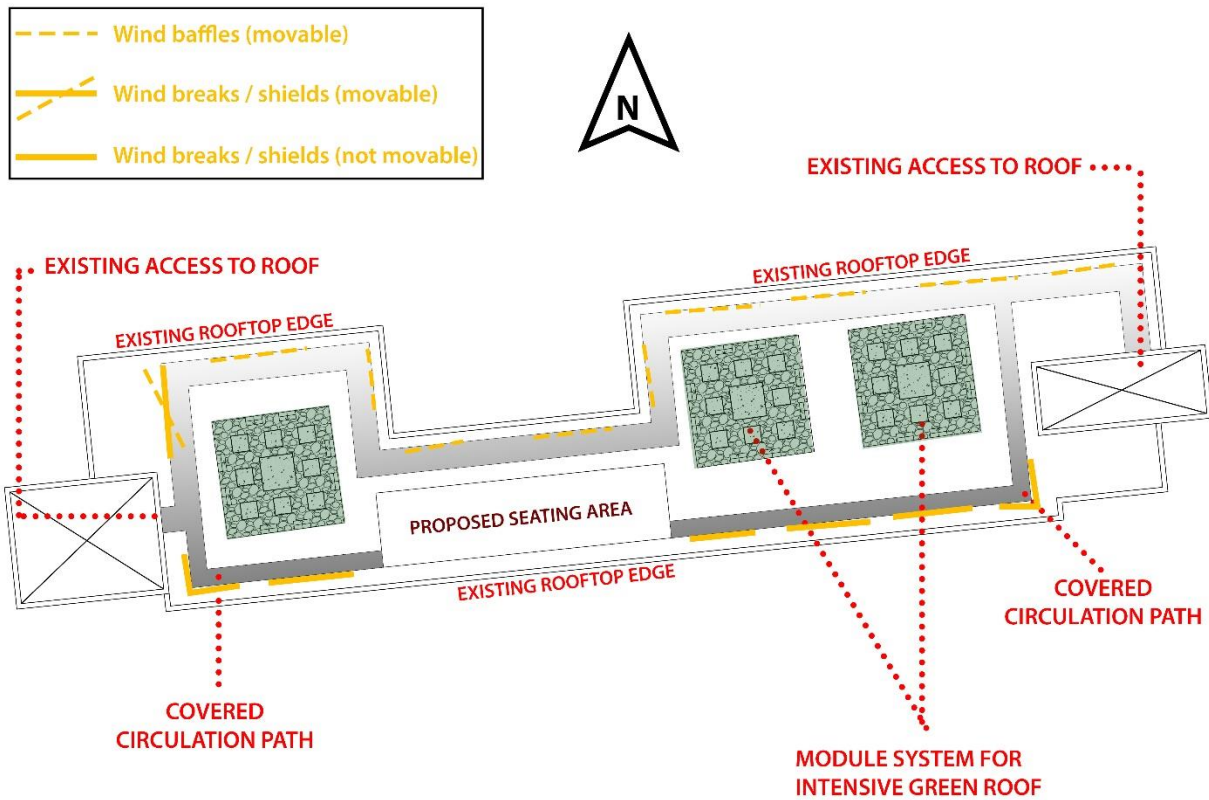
Intensive green roof system for Jaber Ahmad Al Sabah Public School - plan (Prepared by: author)
